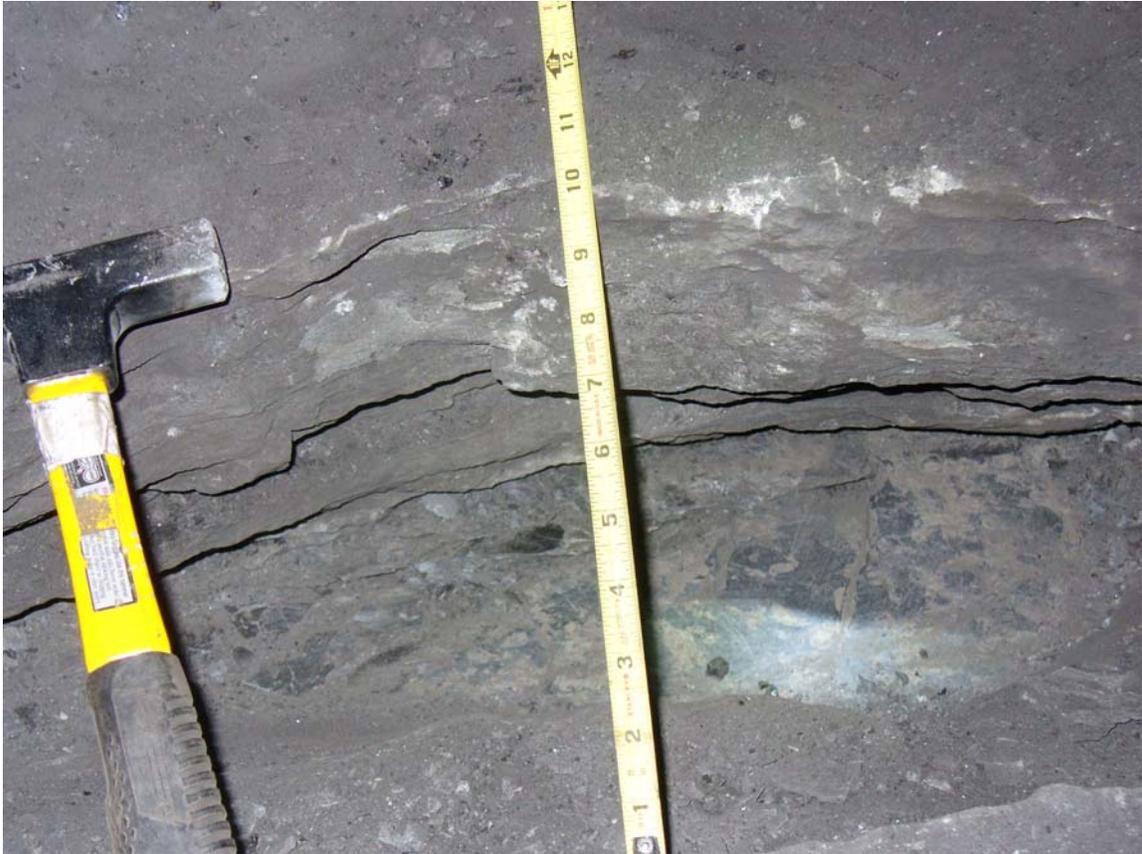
View of exposed floor heave crack looking straight down, with hammer and tape measure for scale. The crack is rootless and dies out approximately 12 inches into the floor at a layer of shale.
